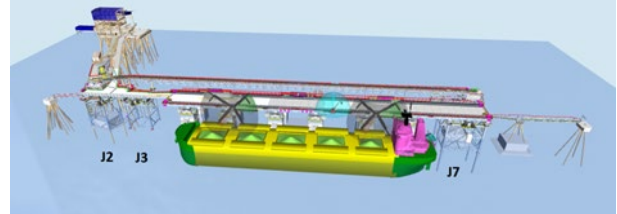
Location of jackets – Berth 2 layout (Source: BMA)
